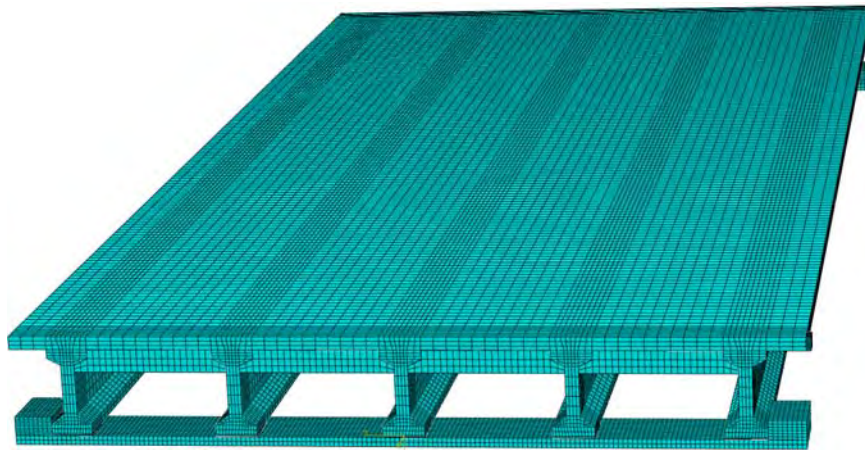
A simplified FE model of bridge installed diaphragm of 25% girder height.
